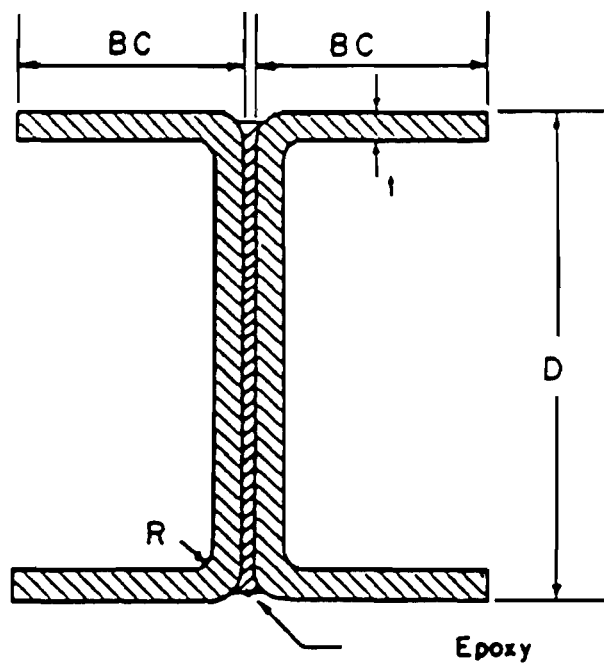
Cross Section of I-shaped Stub Columns Used for the Study of Unstiffened Elements
